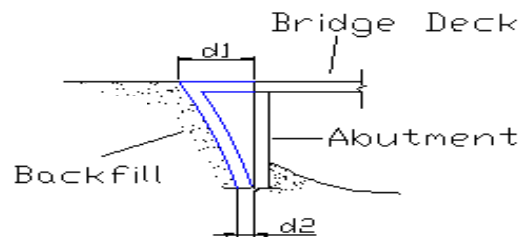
Abutment horizontal translation showing displacement of abutment wall at the base and top of the wall
